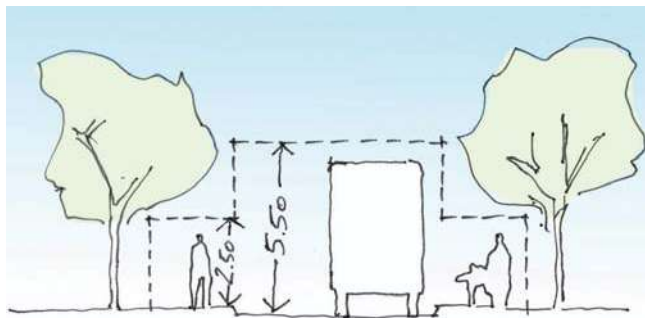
Sketch clearance from plant overhang on carriageways and walkways
